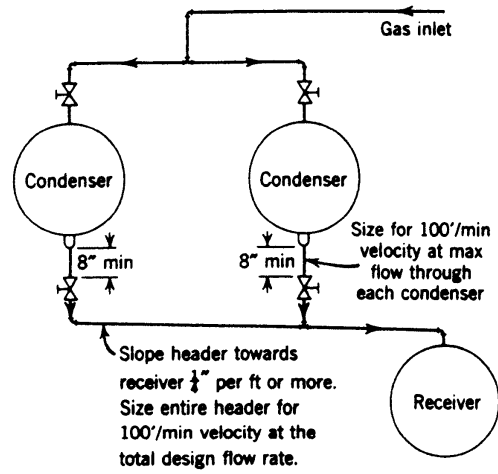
Parallel shell-and-tube condensers with top inlet receiver. (Courtesy of York Corporation.)
